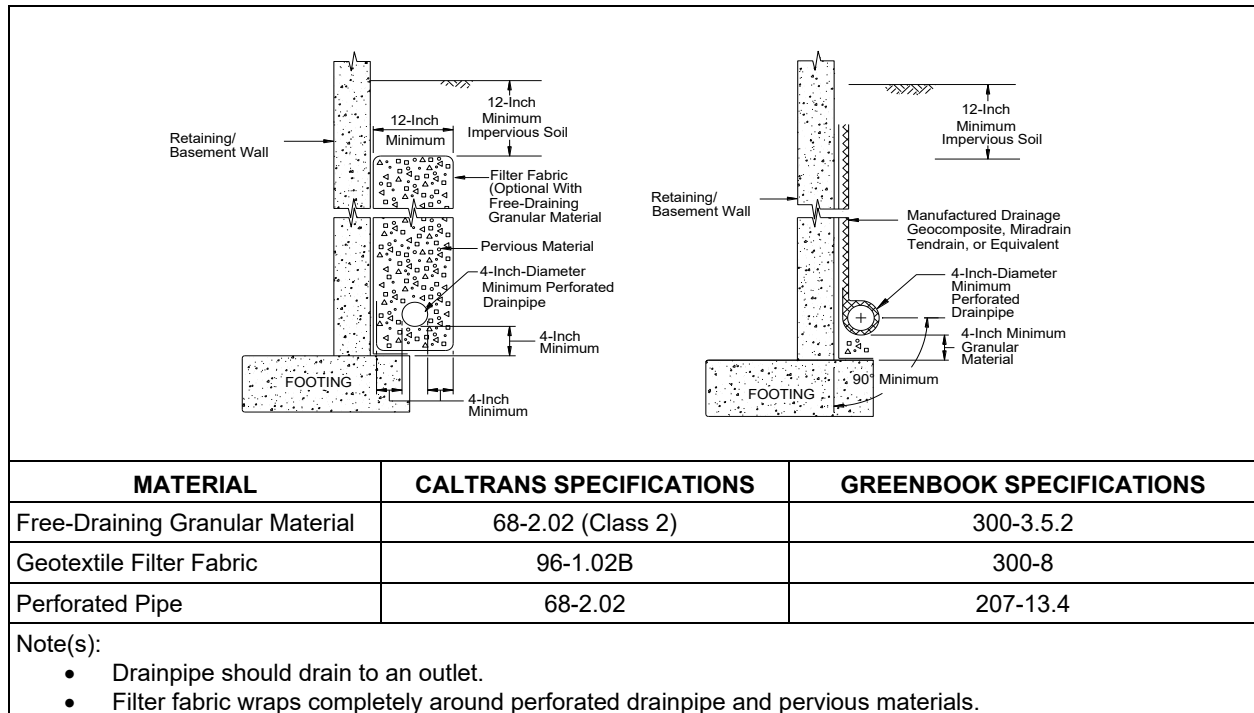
RETAINING OR BASEMENT WALL DRAINAGE
